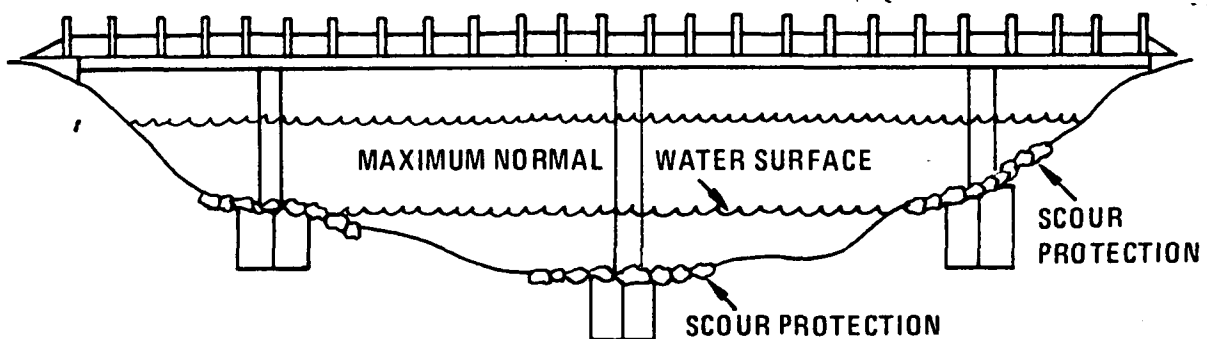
Stream Crossing With Pier In Central Section Of Normal Channel
